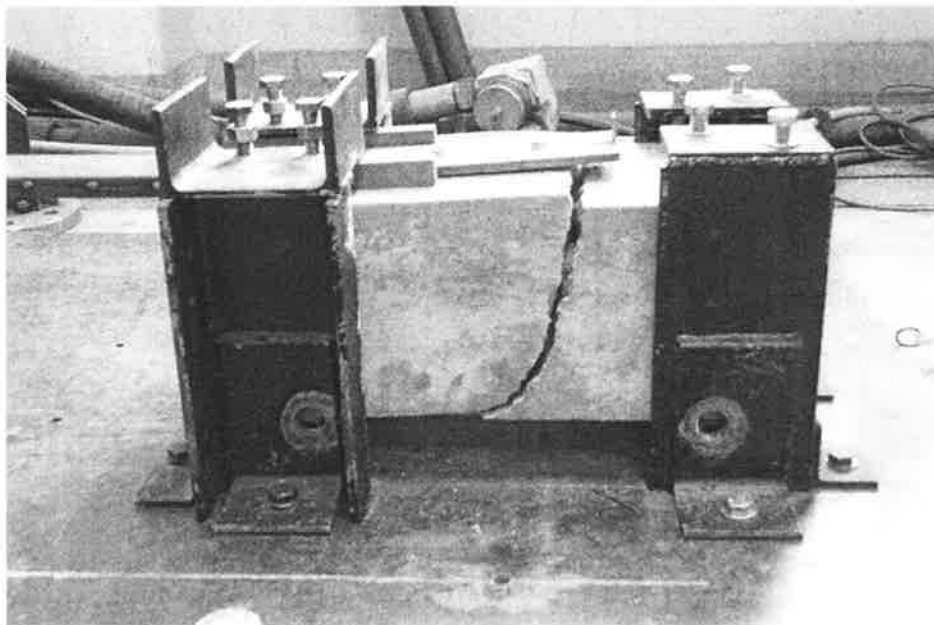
Failure mode of Hilti HSL φ12 bolt test
